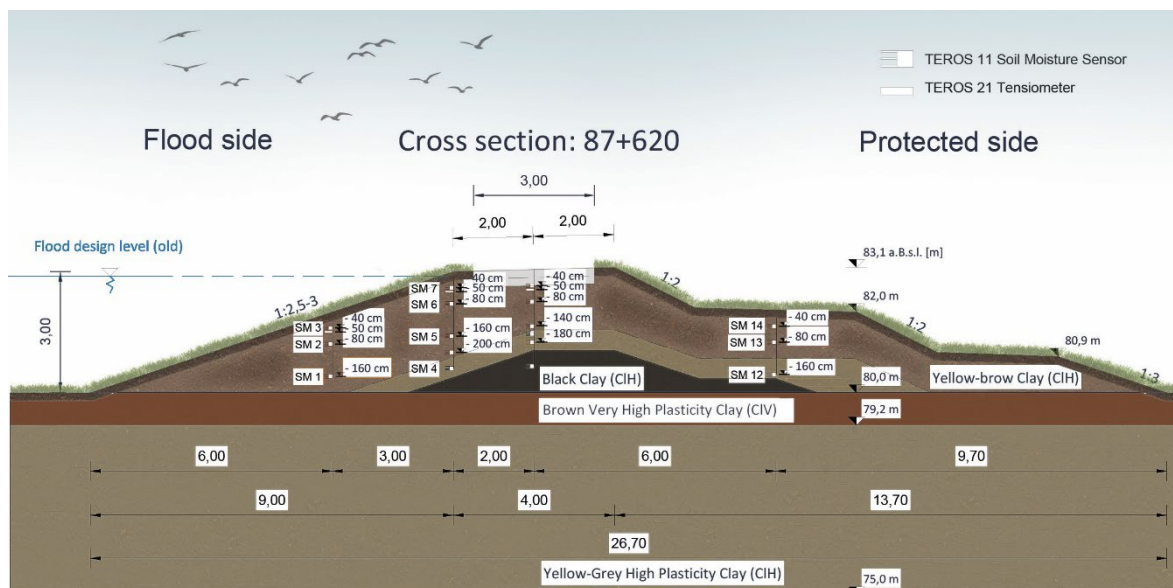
Installation layout of the instruments at Doba section 87+620 tkm
